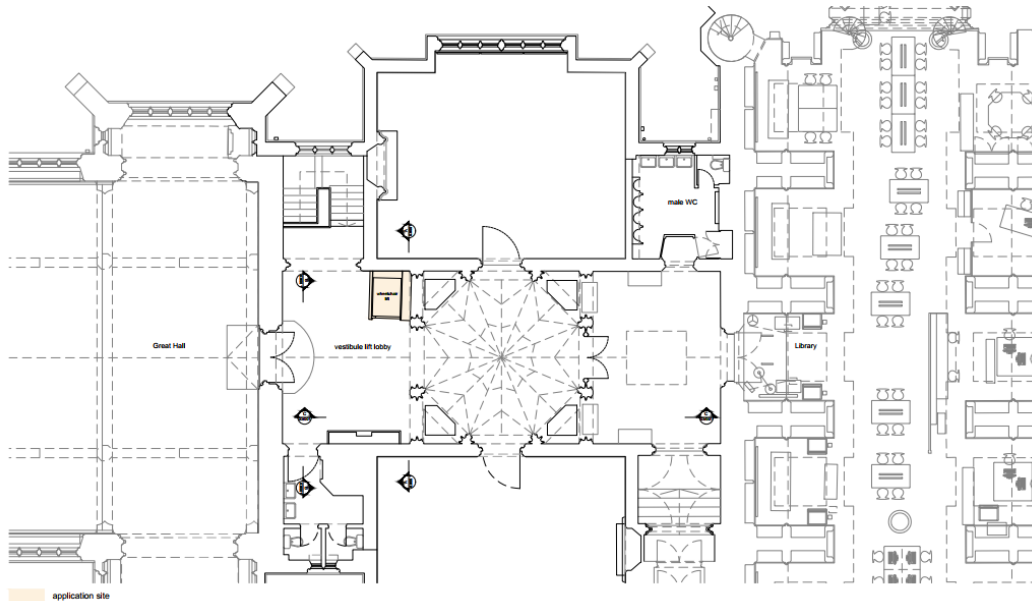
Extract from Plan 1421/01/ 001 showing site (highlighted in pale orange) in first floor Vestibule lobby
